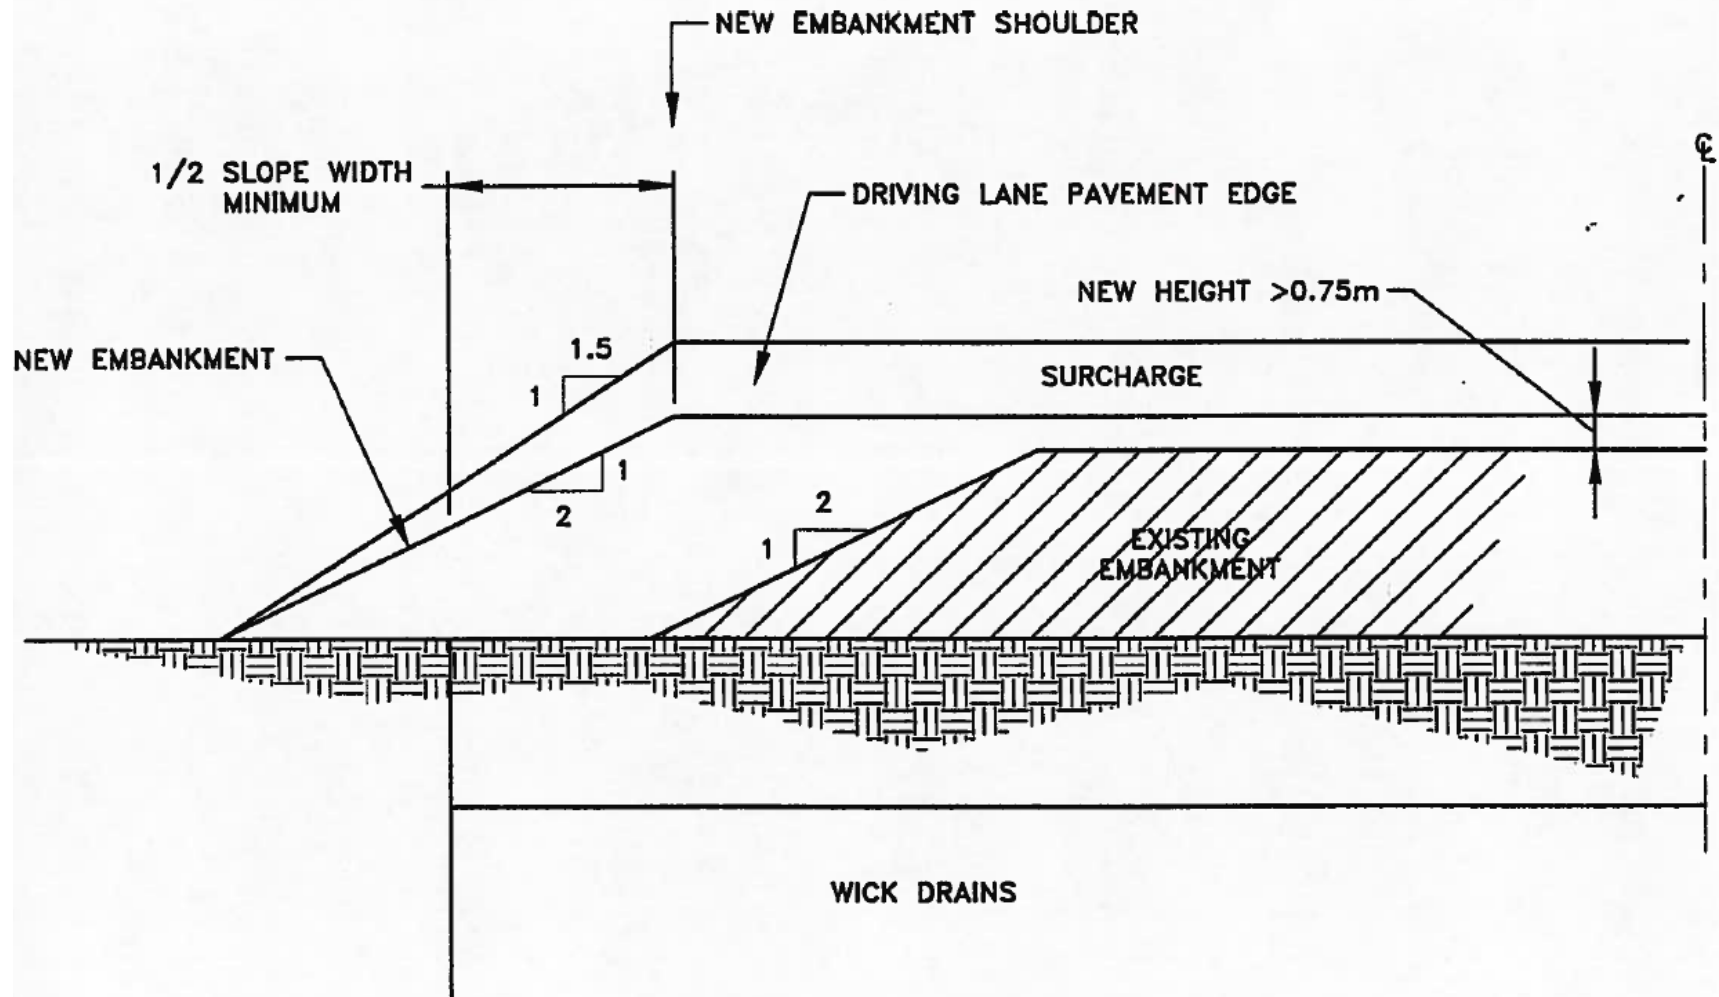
Recommended surcharge layout for cases where new embankment increases the existing embankment height by greater than 0.75 m above the existing embankment
